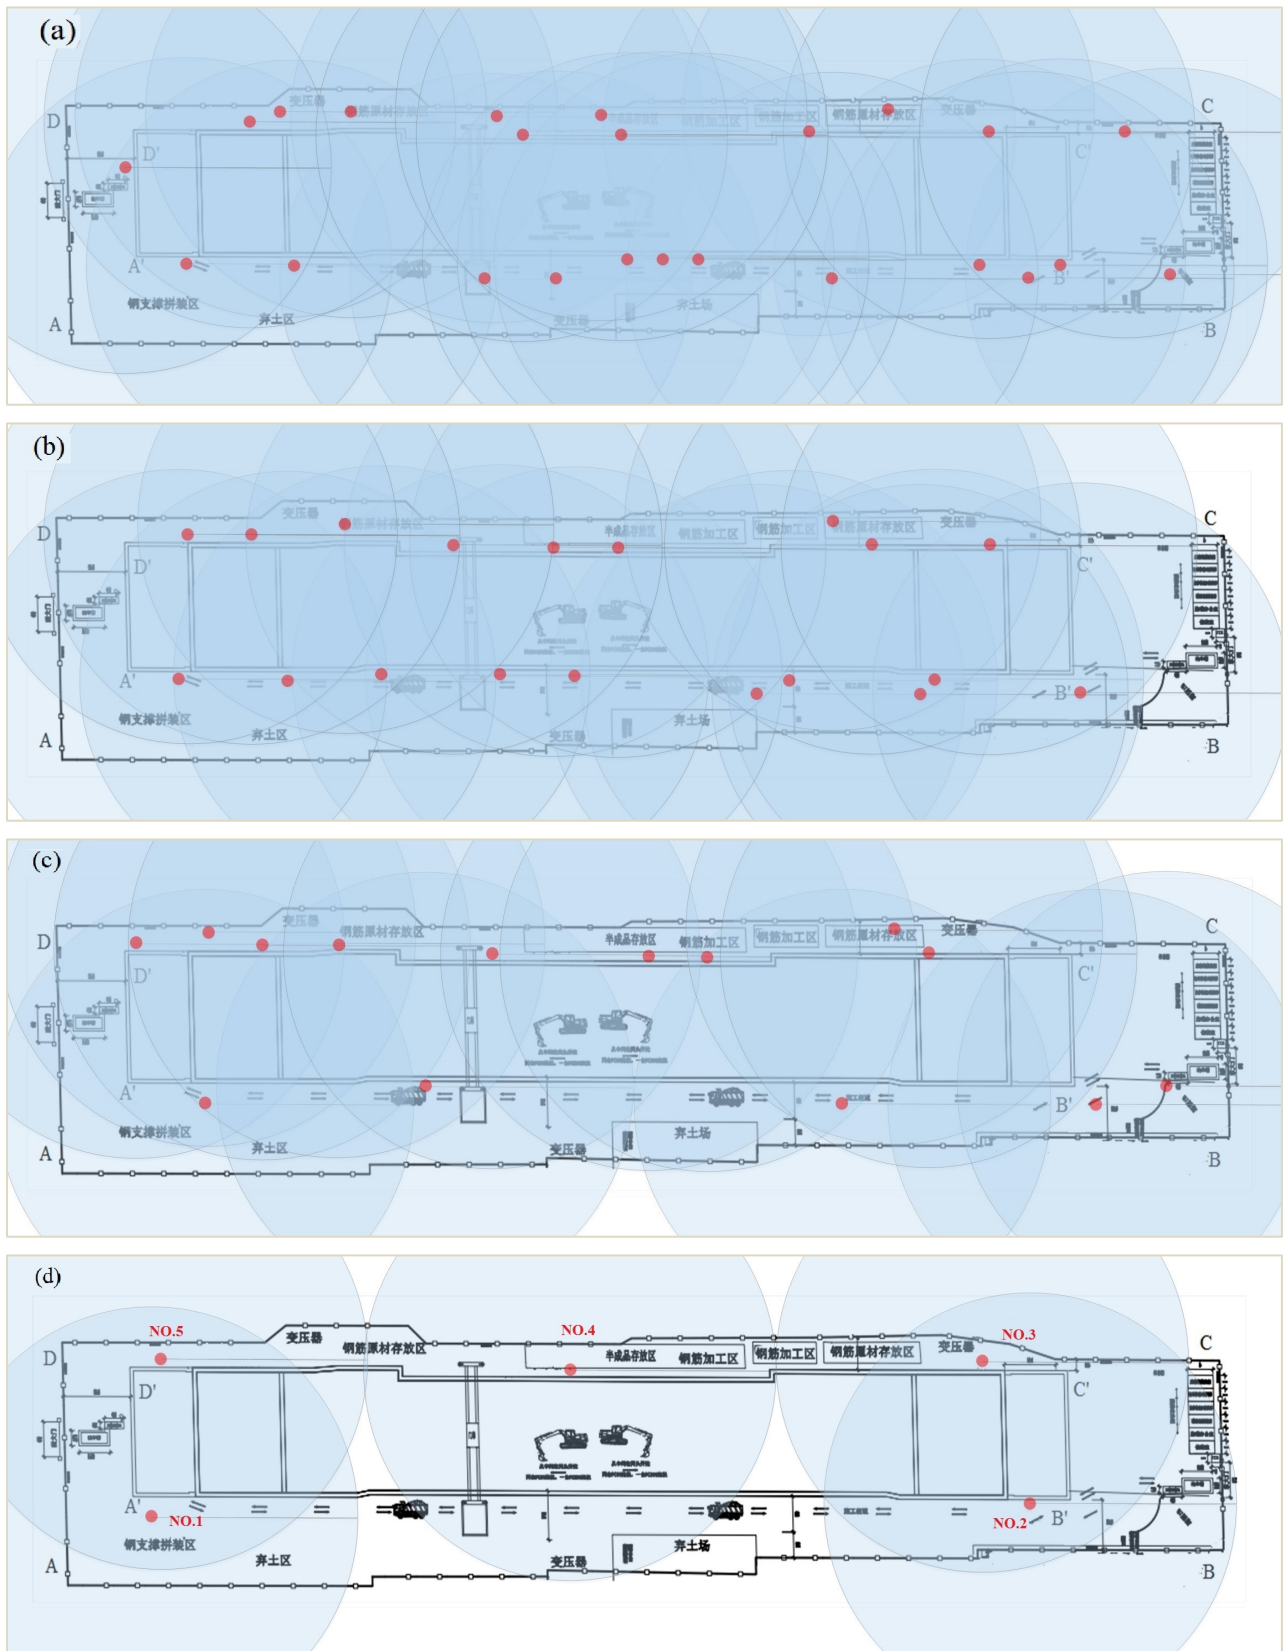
Coverage of optimal camera placement plan for (a) bottom slab, (b) medial slab, and (c) roof slab constructions; (d) placement plan of original cameras
